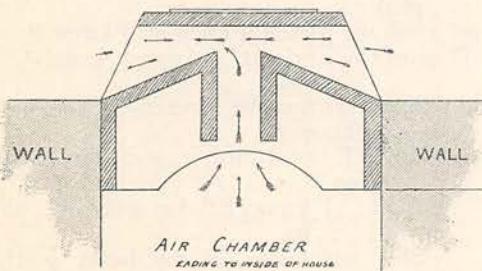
HORIZONTAL SECTION OF AIR BRICK.
